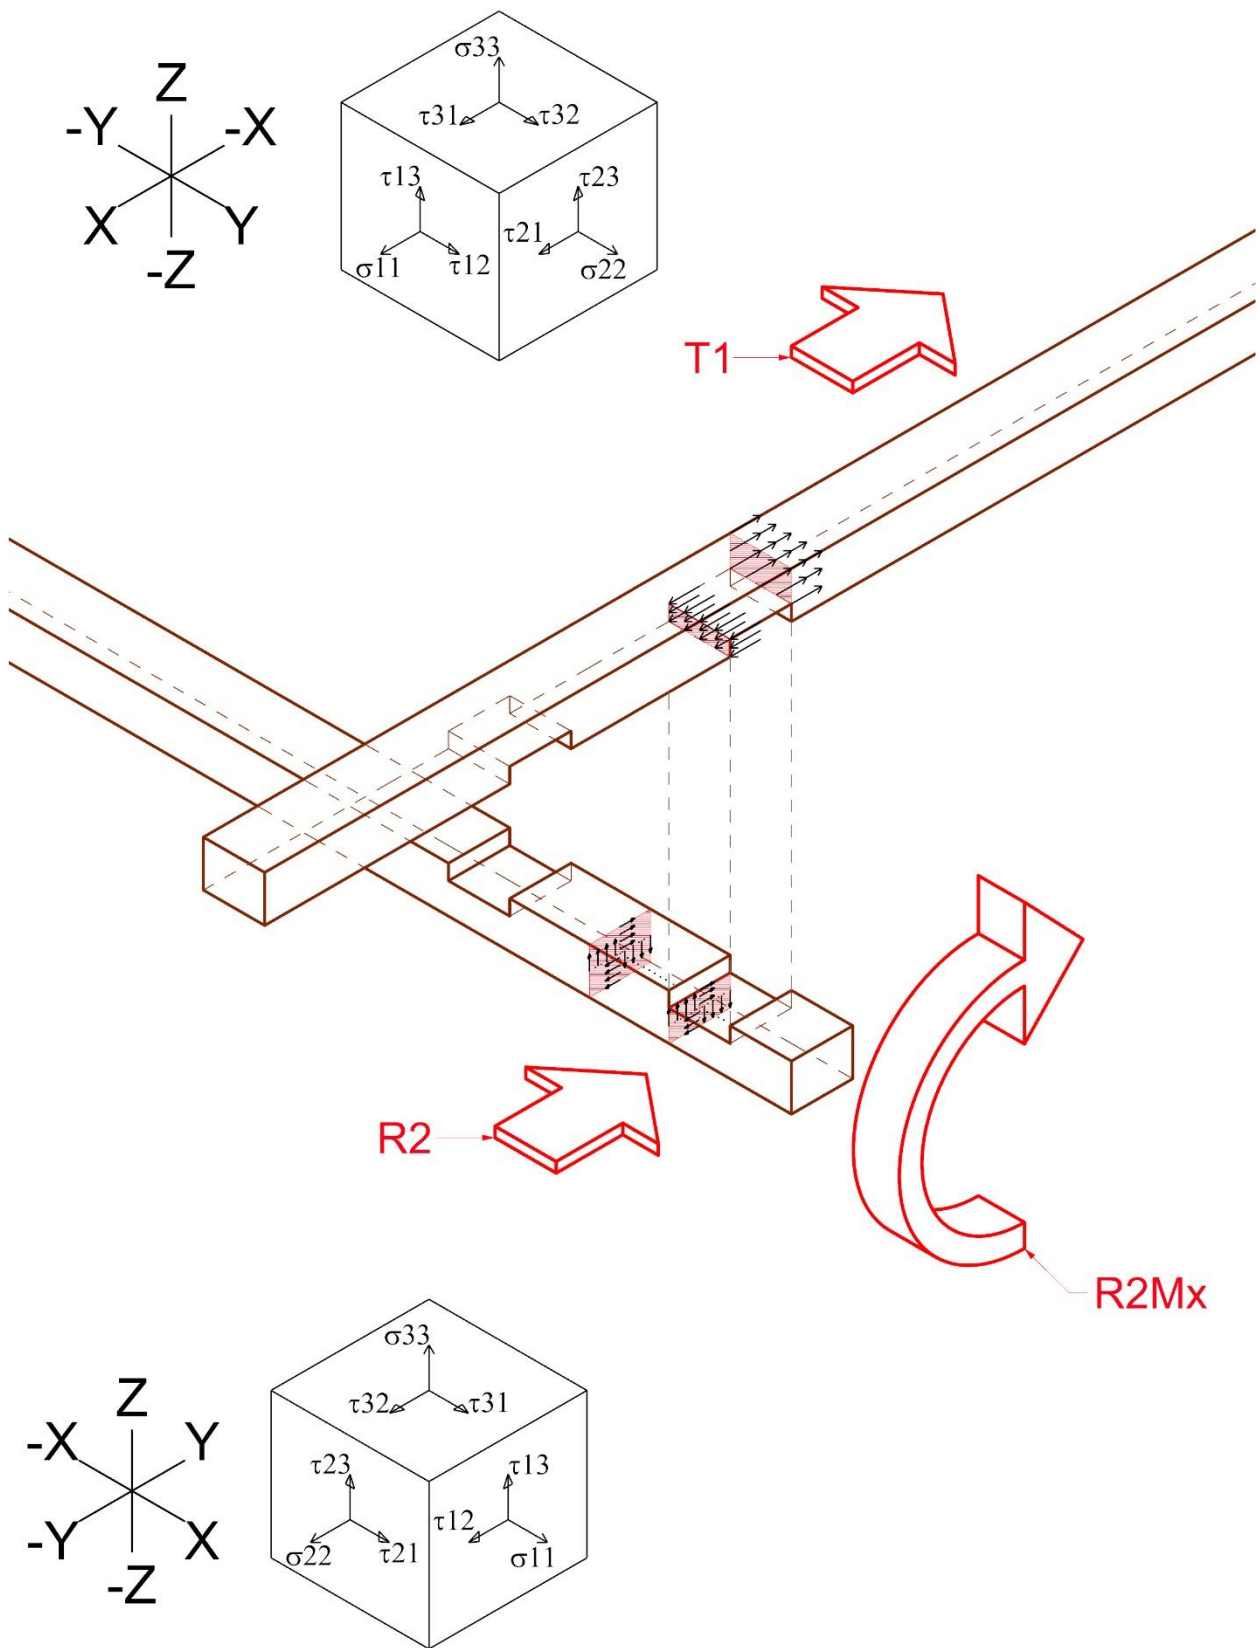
Roof Rafter Head Bending moments: Torsion: Tangential stresses: Crossing rafters T1-R2
